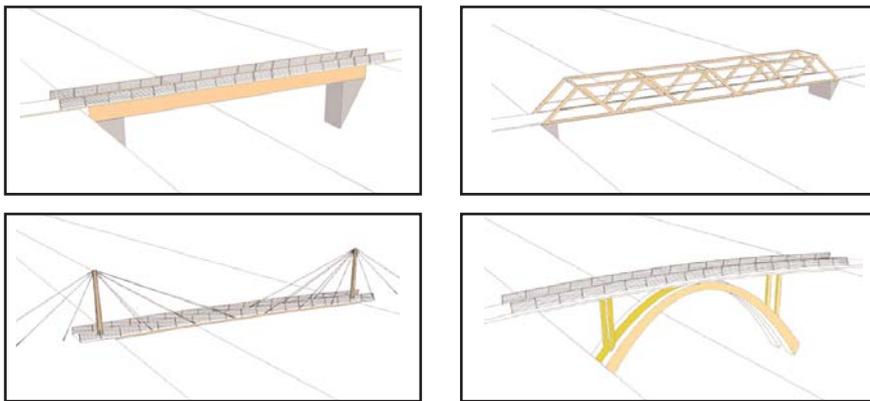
The four main bridge types commonly employed for short and medium spans in timber. Clockwise from top left: beam, truss, arch and cable stayed
